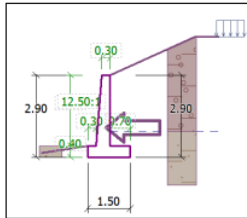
The results of the safety factor analysis on slope reinforcement modeling using retaining walls at GEO5 without earthquake loads at STA 490+870.
